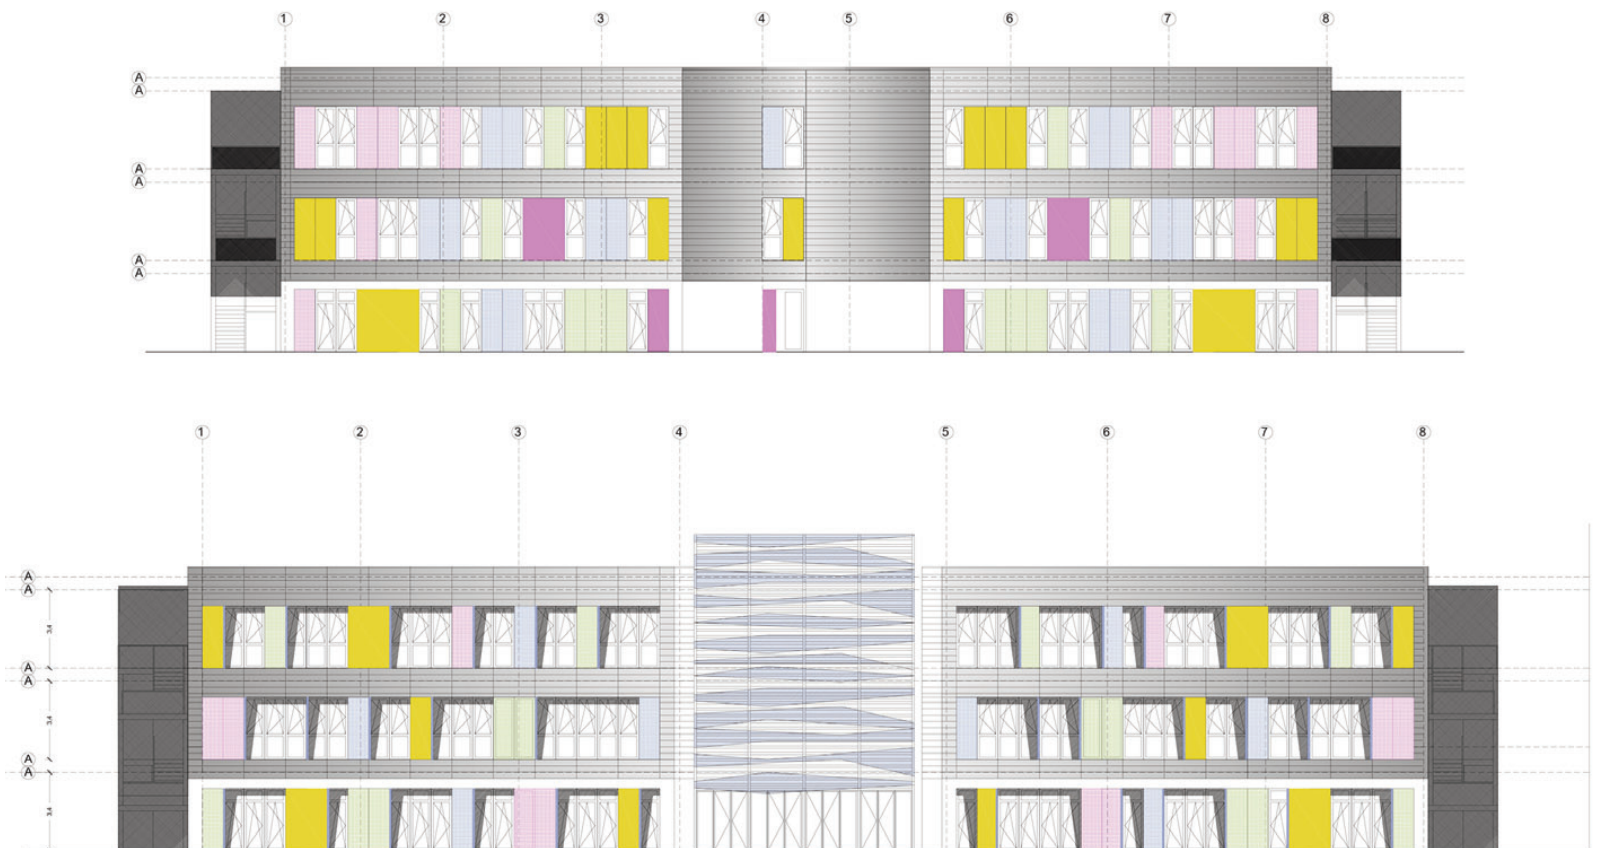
, 10 | The South elevation under construction; Design of exterior elevations (credits: Centro ABITA, 2019).
